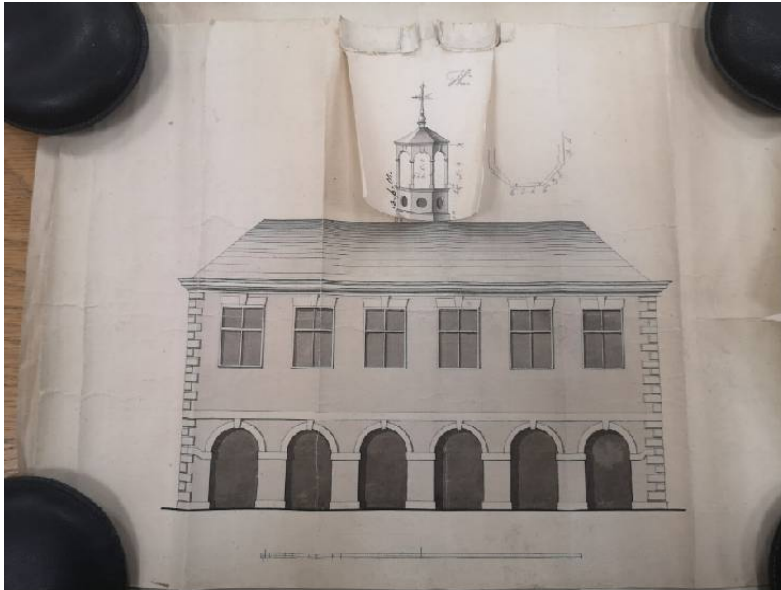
Image of original drawing of Market Hall could be Southern or Northern Elevations D-BASM/2/57
